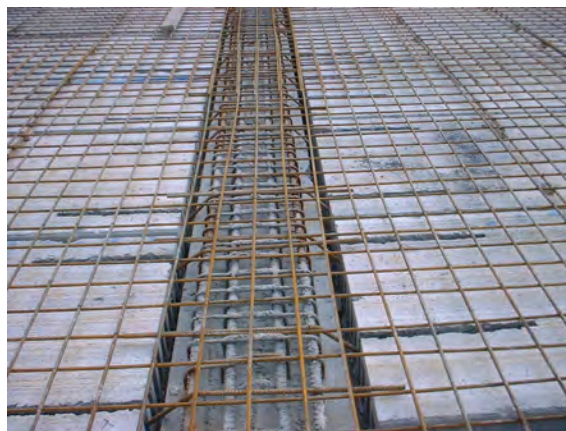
Hollowcore slabs with open cores at ends for reinforcement connection over precast concrete beam.
